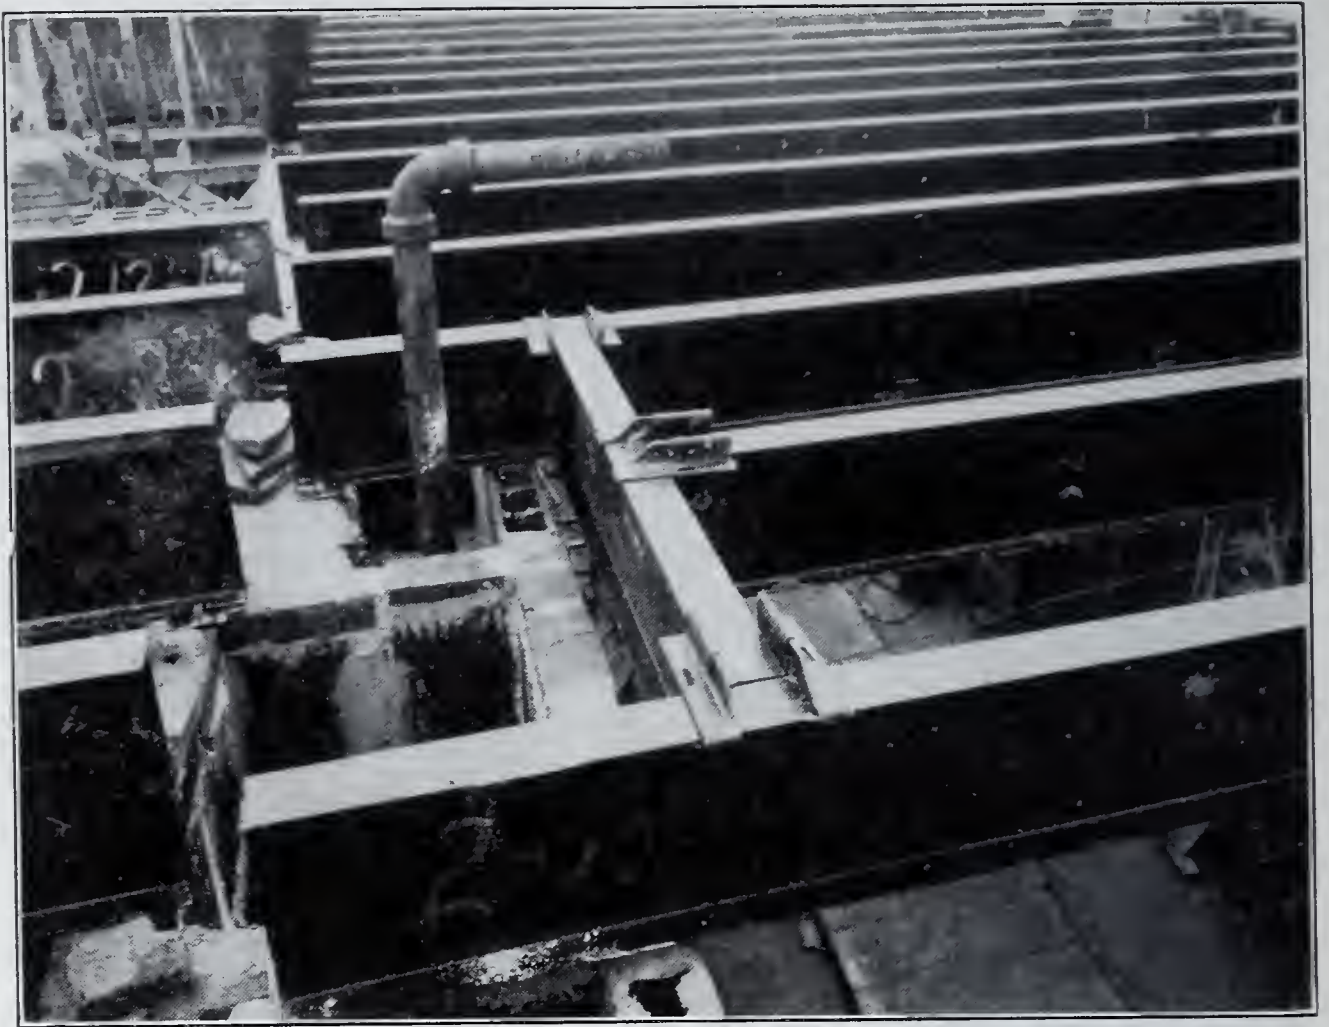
Construction of Westfield School, Fort Wayne, Ind.
